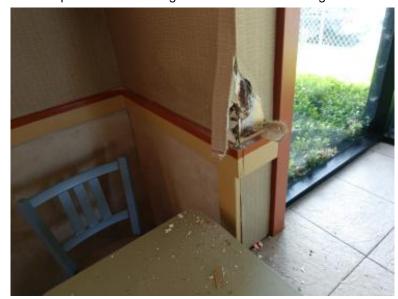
Caption: Tan Wall Covering, Perimeter Greenboard
